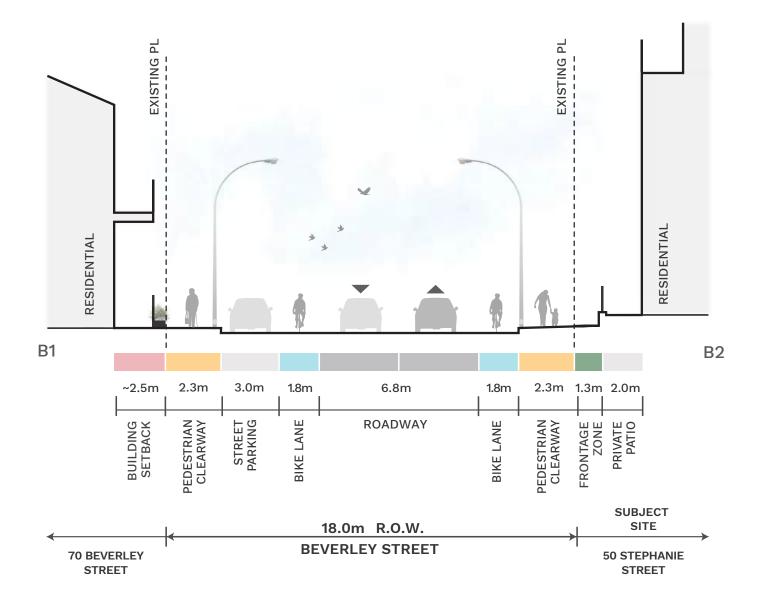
Proposed Street Section - Beverley Street (Looking North)
